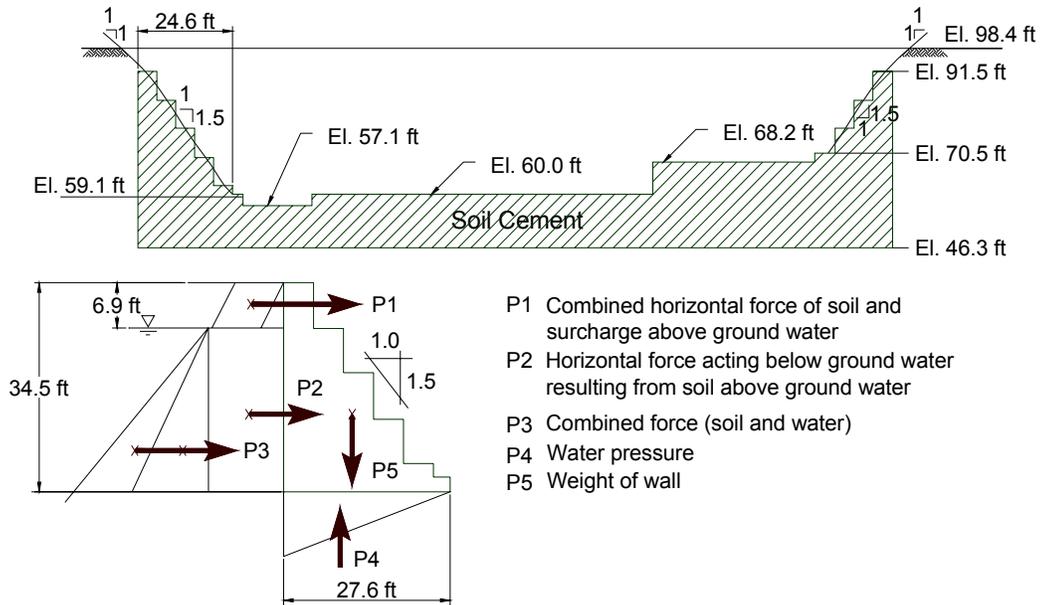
Cross Section A-A (Courtesy of Bechtel Corporation & EERI)
